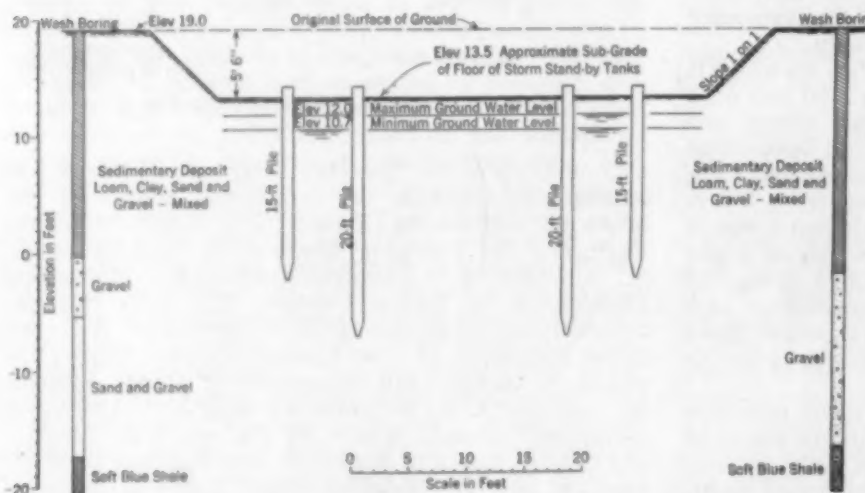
LONGITUDINAL SECTION THROUGH THE EXCAVATION FOR TEST PILES
